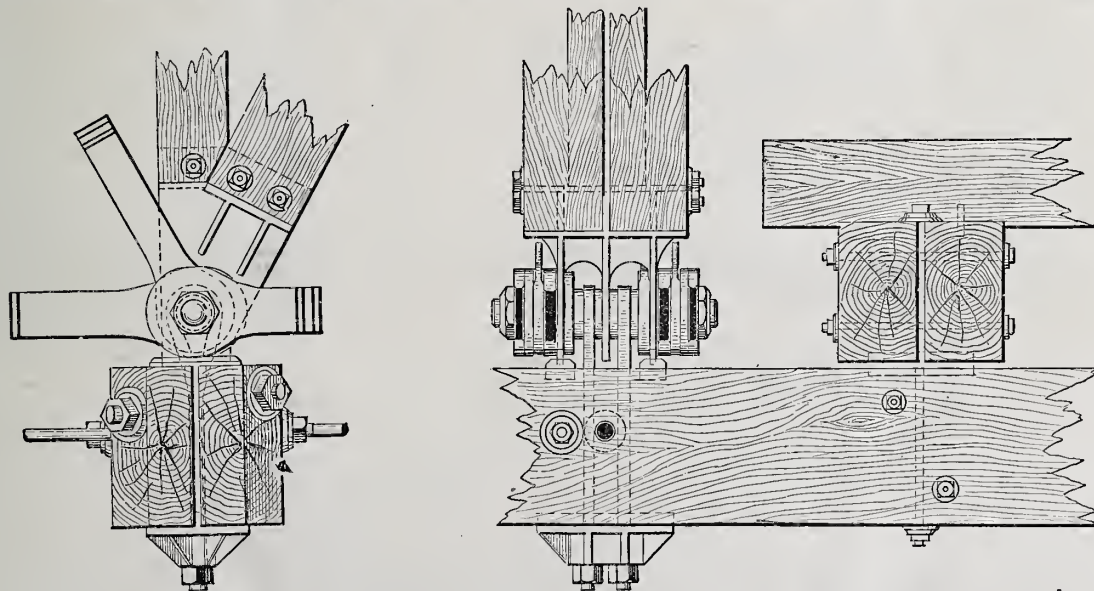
Details of Lower Chord and Floor Beam at Second Compression Brace.
